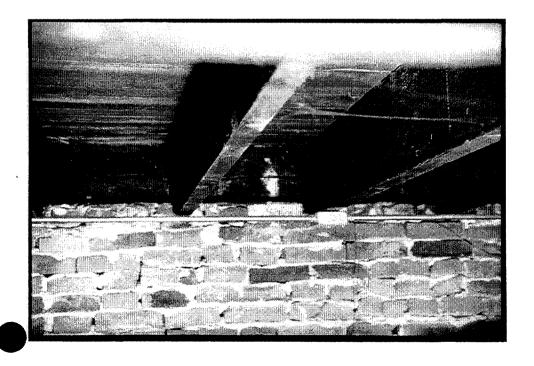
FIRST FLOOR JOISTS AT THE FOUNDATION WALL
